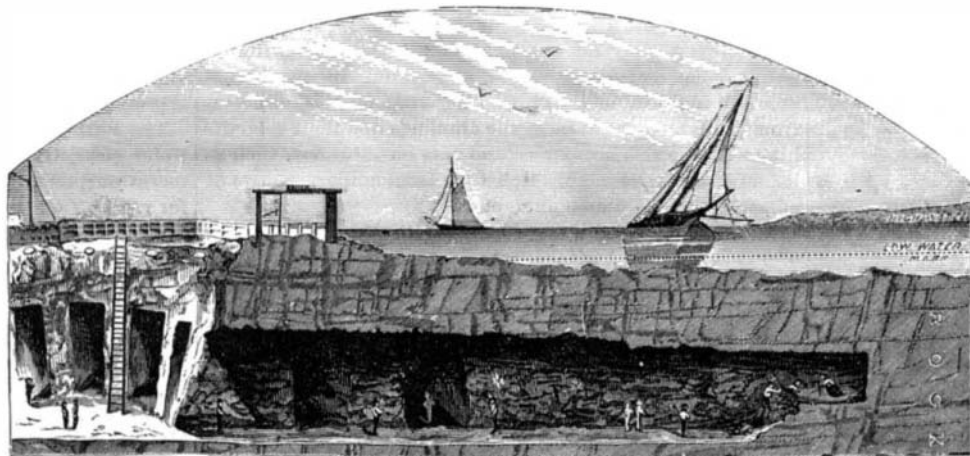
LONGITUDINAL SECTION OF GRANT HEADING.
